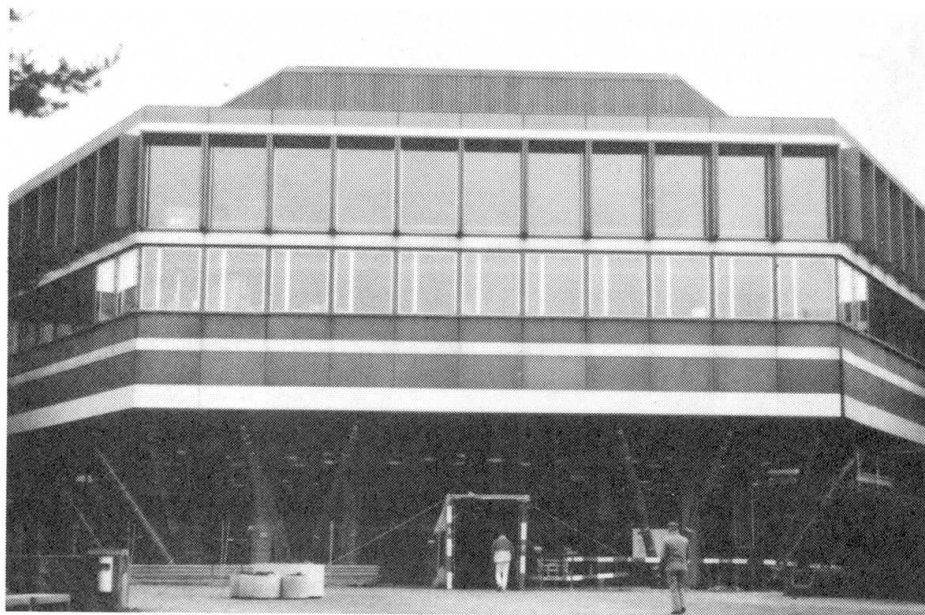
View from outside towards the upgraded building (during construction). The diagonal steel trusses are the main strengthening elements
